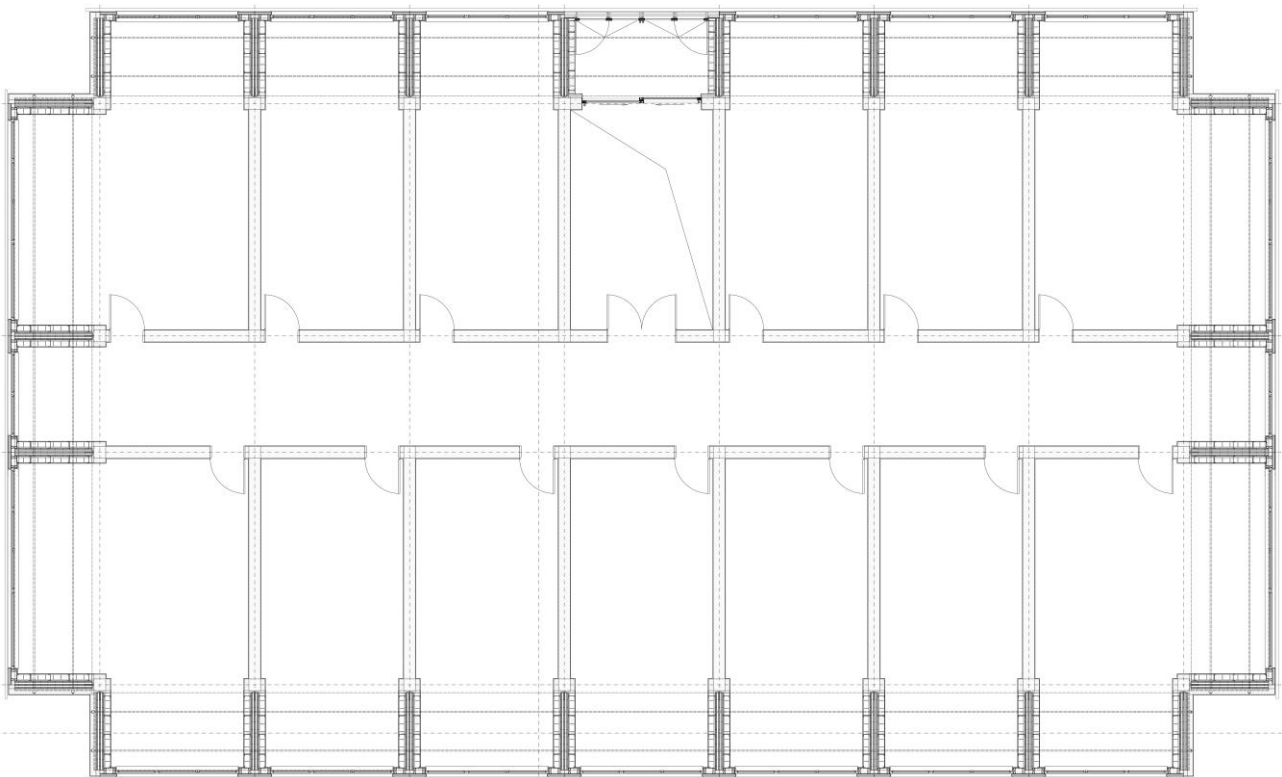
Technical drawing of the plan of the type-floor of the wood-based exoskeleton applied on the MRF RC Brasov case study, showing the architectural extension of the existing building providing extra-room units
